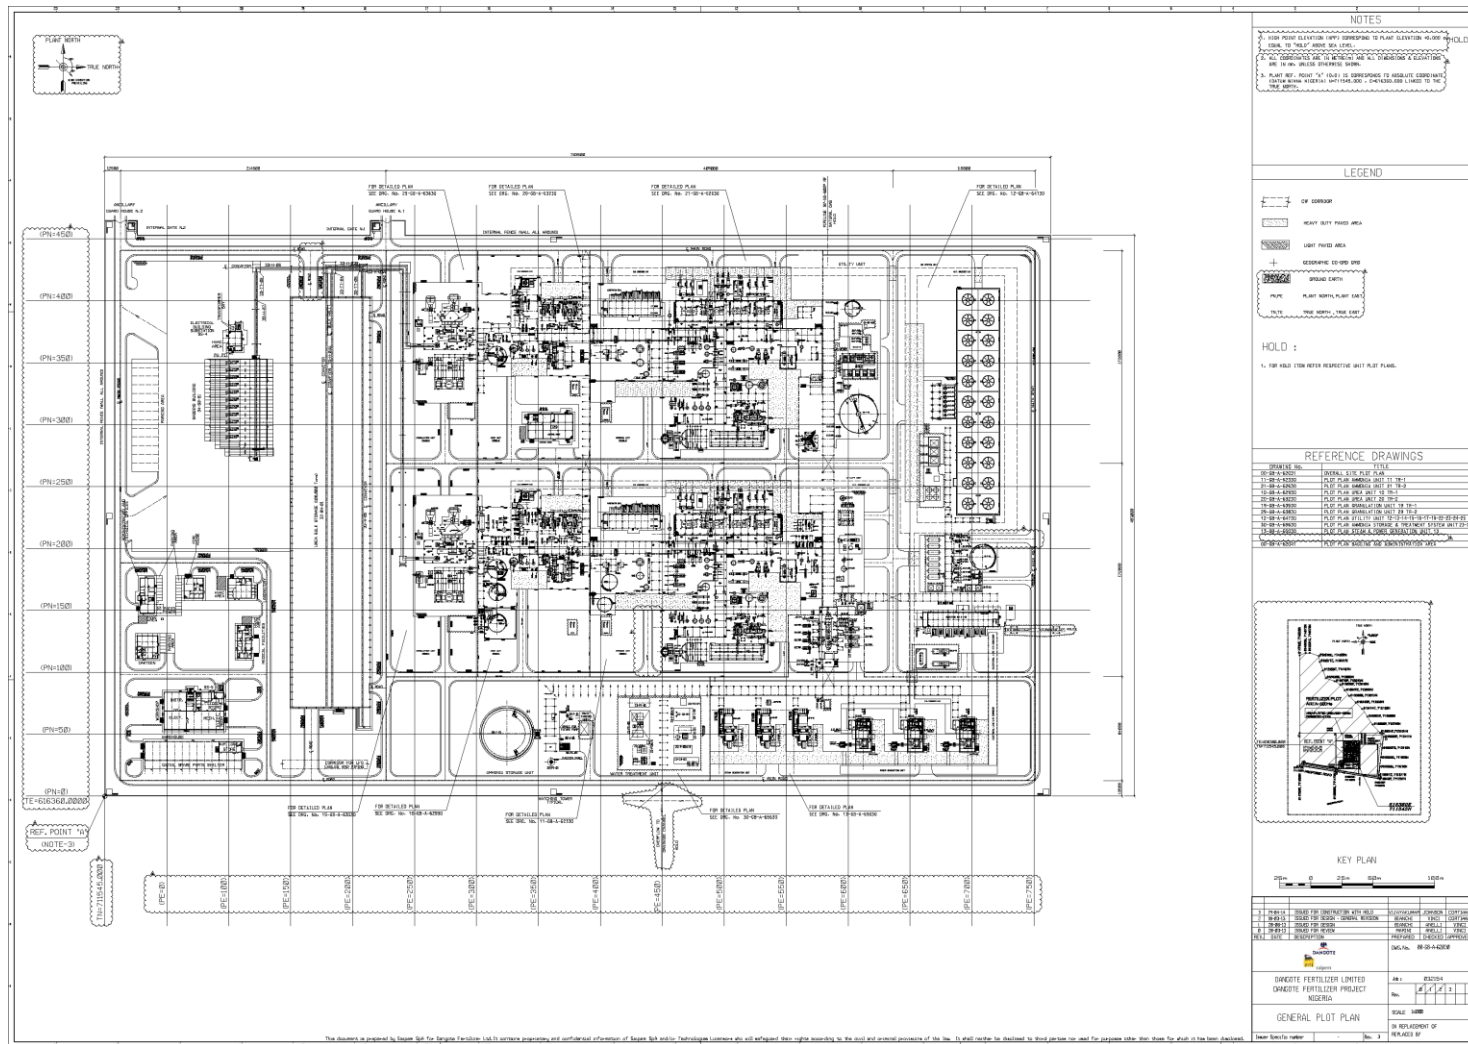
Dangote Fertilizer Plant Detailed Site Plan
